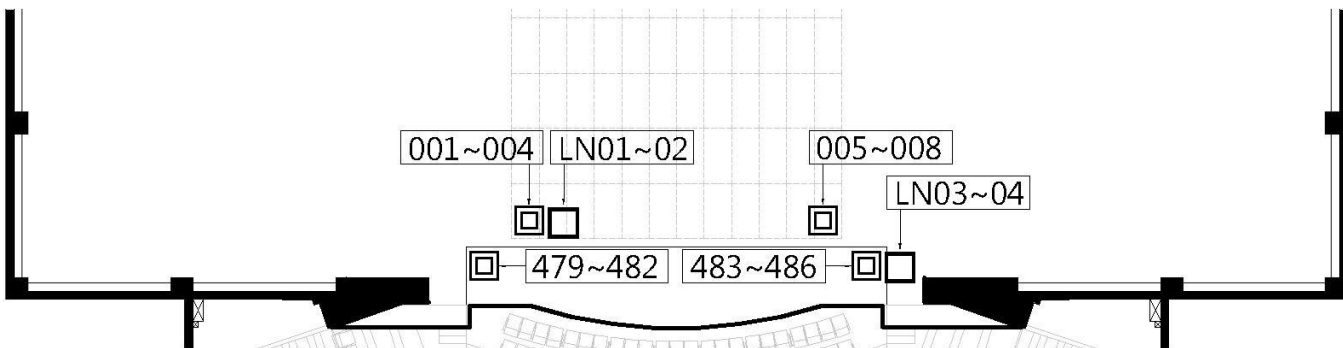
Stage Traps Room and Orchestra Pit Elevation Platform Circuit Layout
